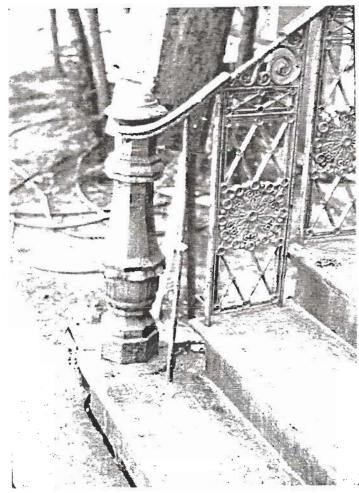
North Entrance Portico Cast Iron Post and Filigree Detailing at Railing.
